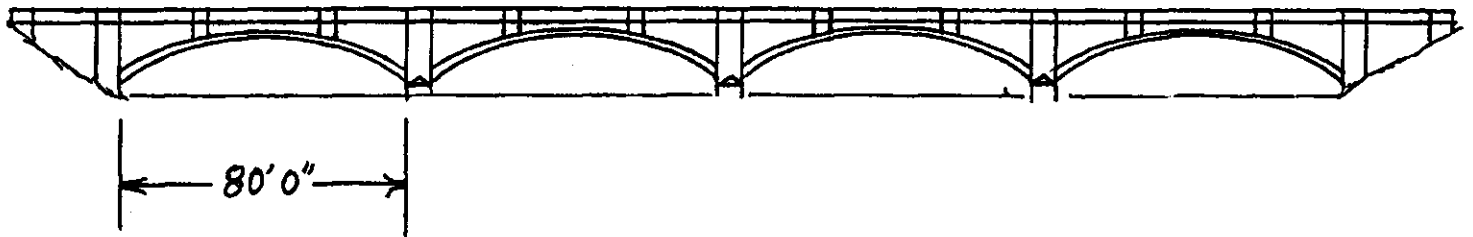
Profile sketch of the Wapsipinicon River Bridge
